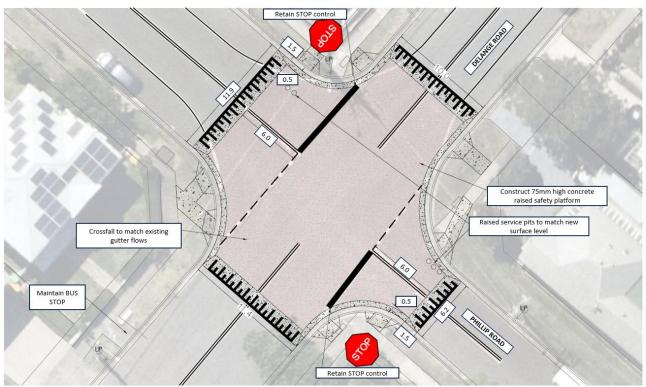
Proposed raised pavement treatment at the intersection of Delange Road and Phillip Road, Putney
